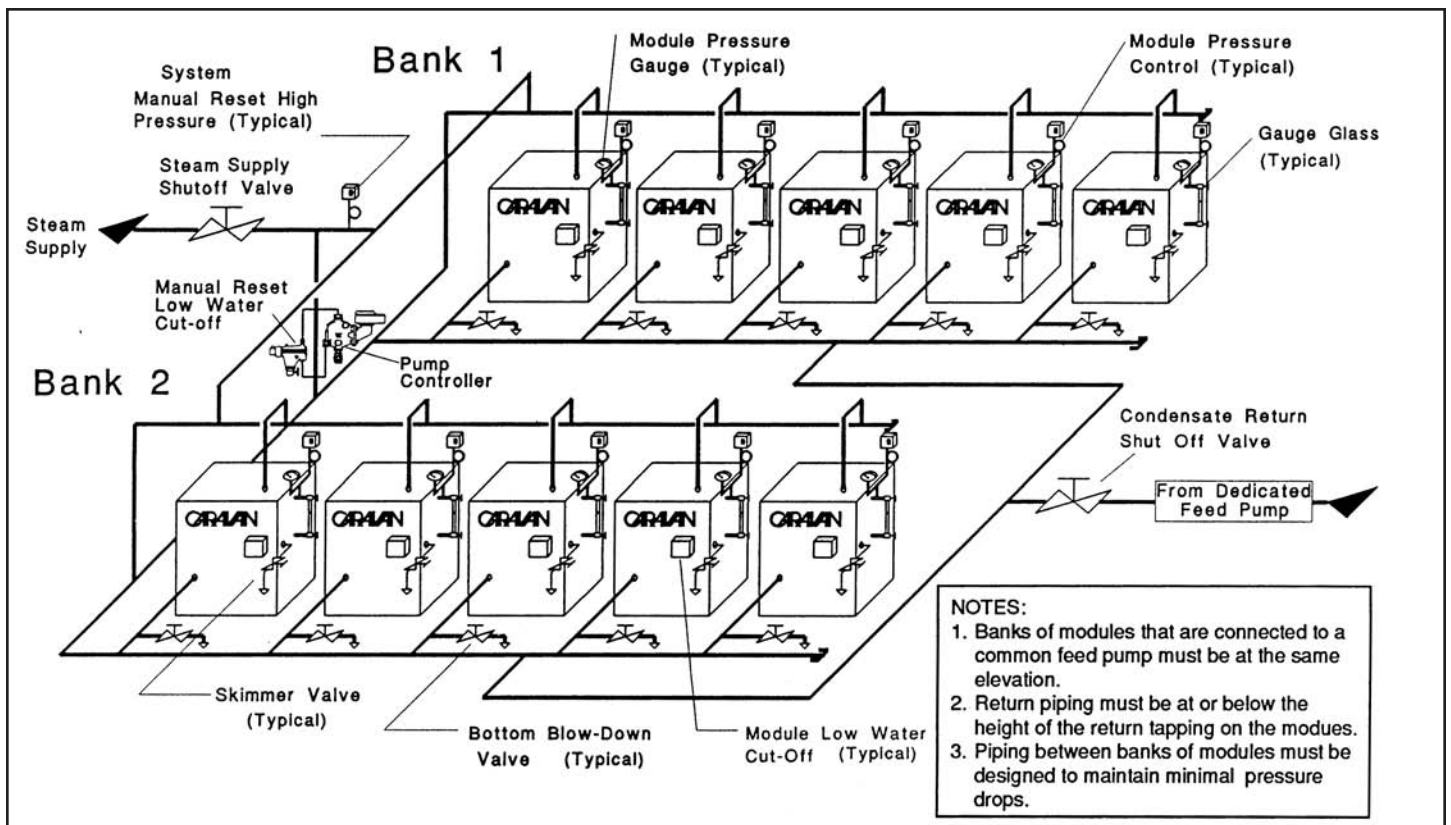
Steam modules, integrated banks (Note: For detail piping refer to pages 8 & 9)
